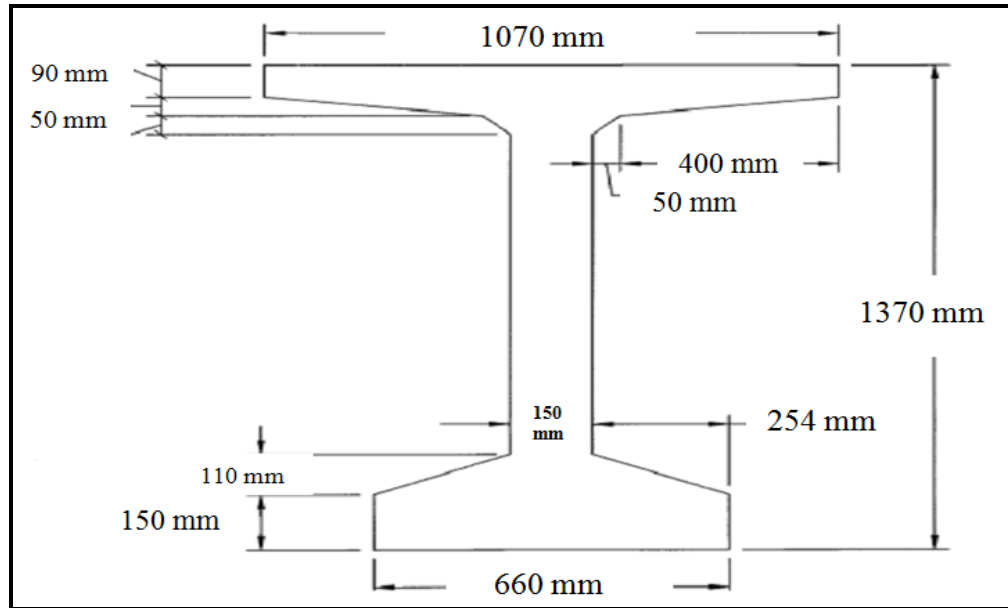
Cross-Section of Bridge Model No. 2: Slab on BIV36 Girders Bridge.
